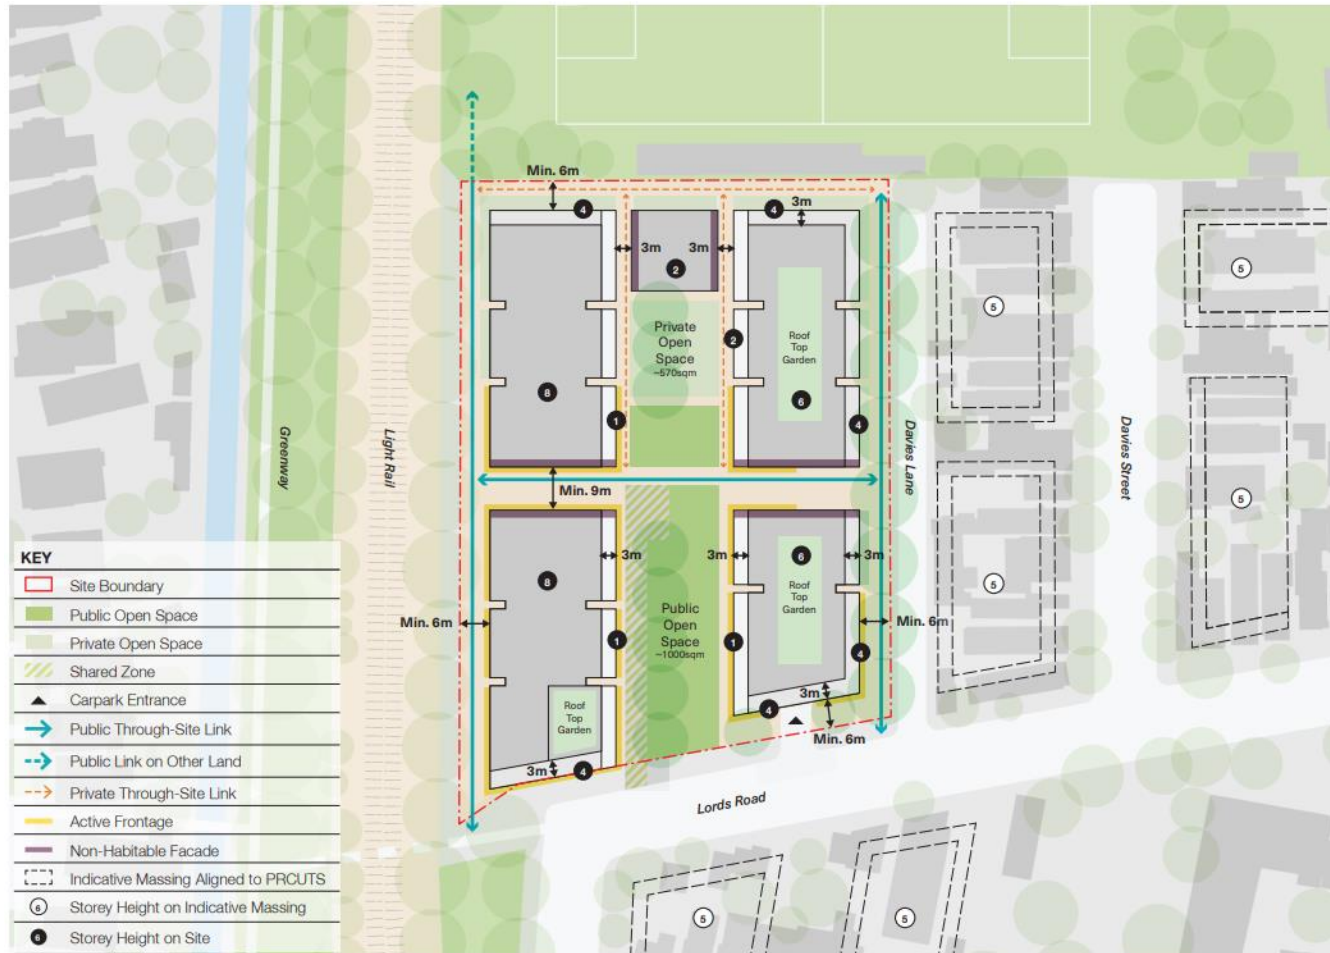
2022 Planning Proposal Concept Plan (Source: Appendix D: 67-75 Lords Road Masterplan: Urban Design Report)
